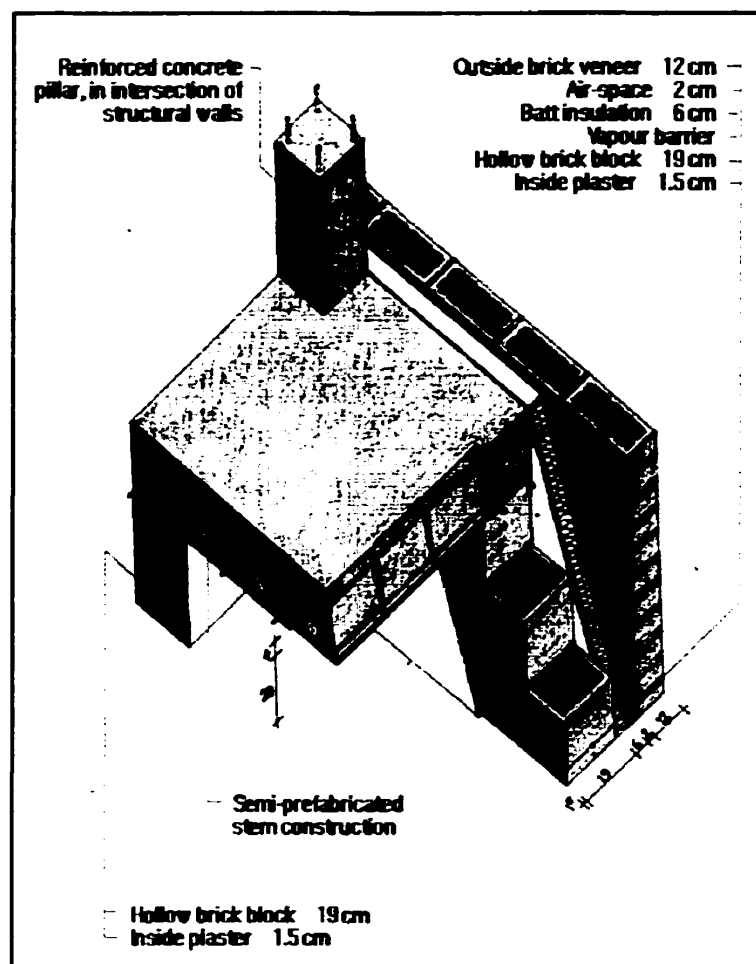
Section through the structure of the typical single family house (the right side shows what the building codes require, and the left side what is usually done).
